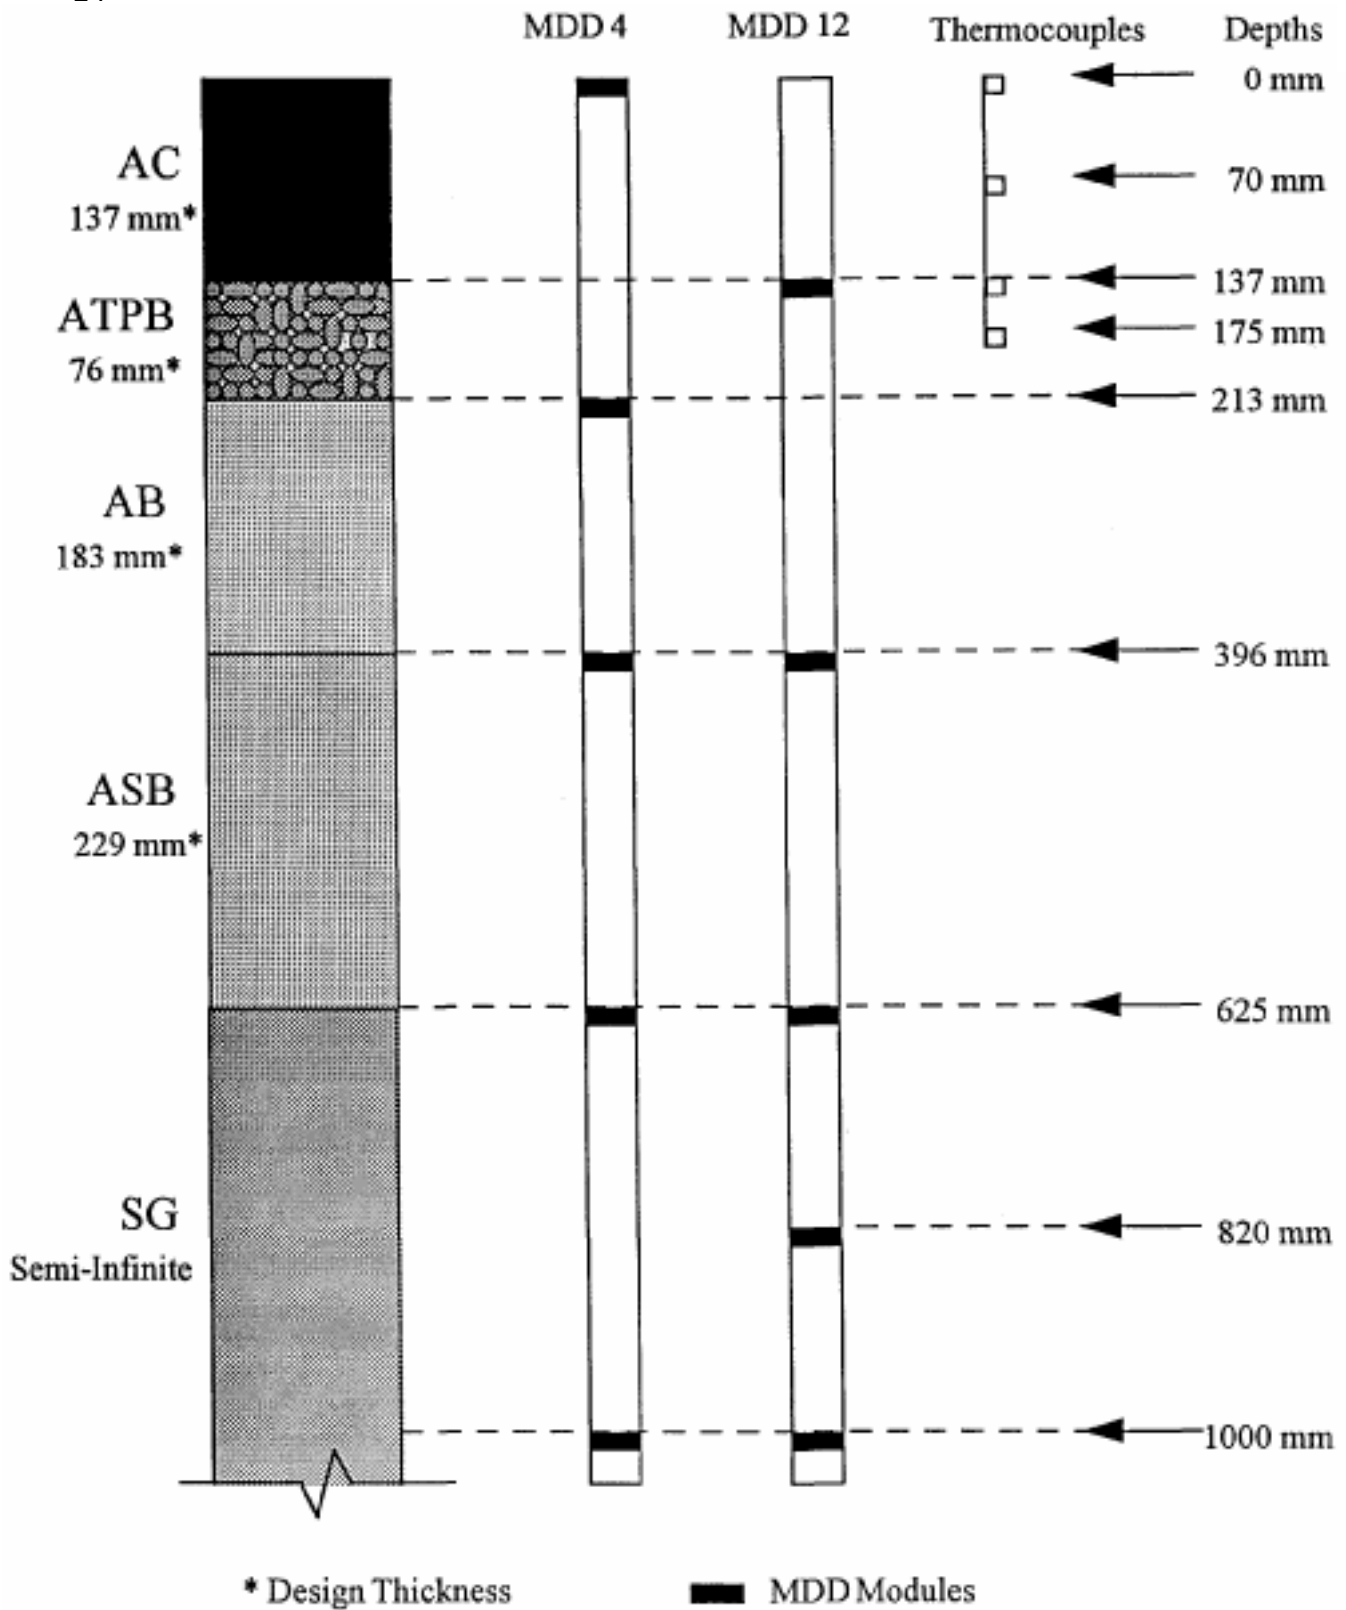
500RF Pavement Structure with MDD and Thermocouple Positioning
